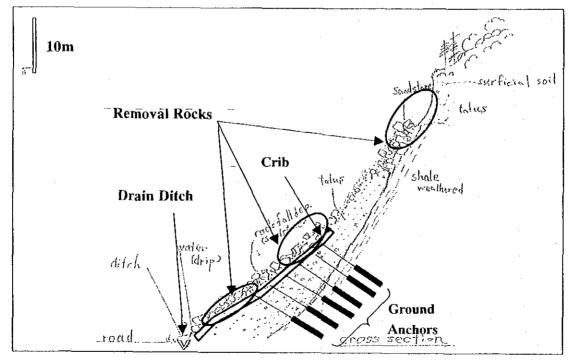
Cross Section (Crib with Ground Anchor)
